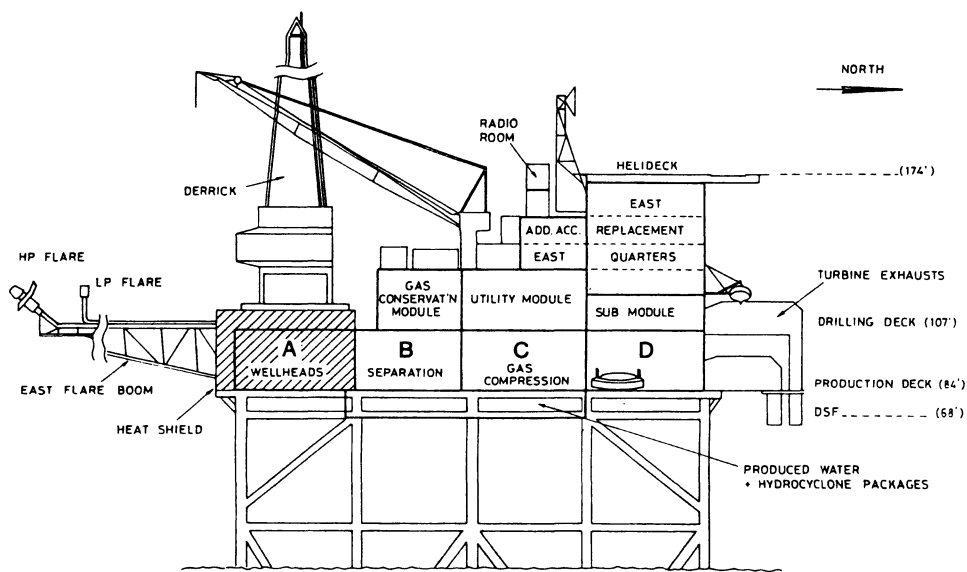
PIPER ALPHA - EAST ELEVATION
